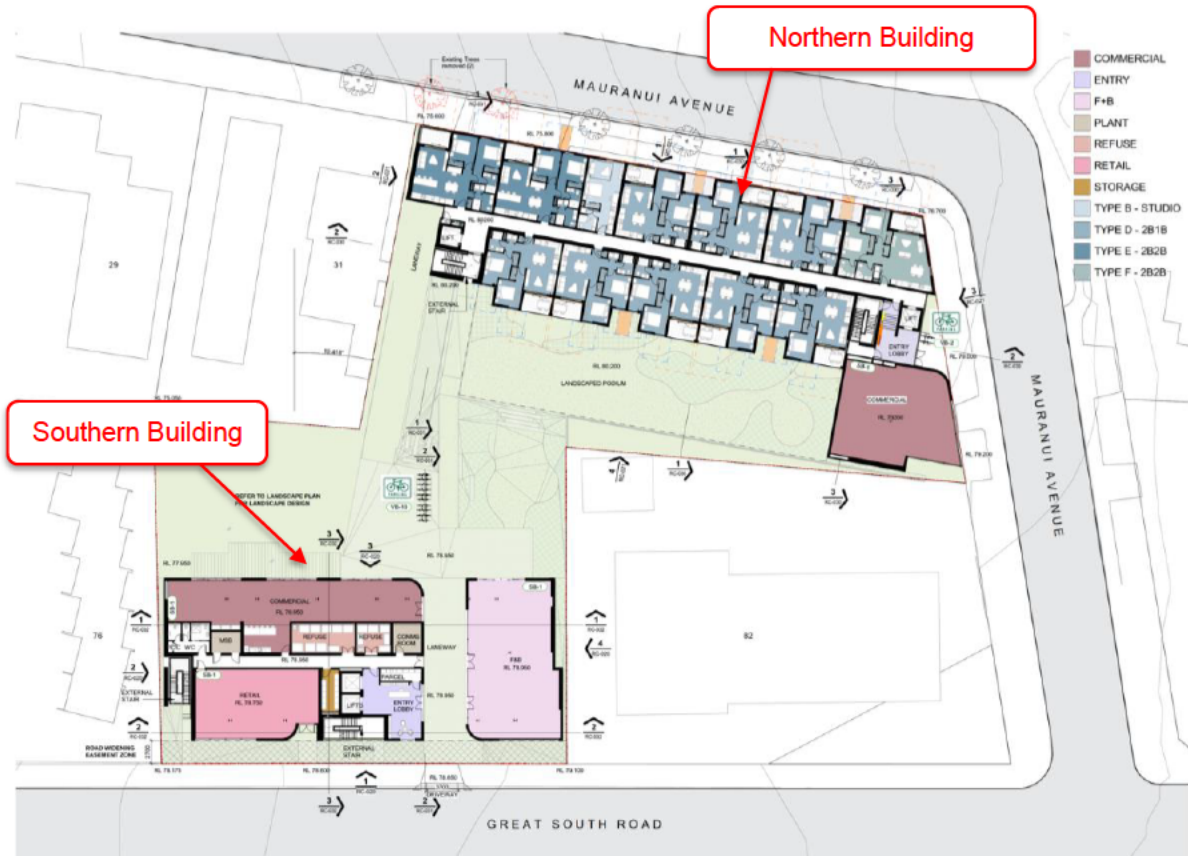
Site Plan / Ground Level - [JASMAX – DWG:RC-011]
